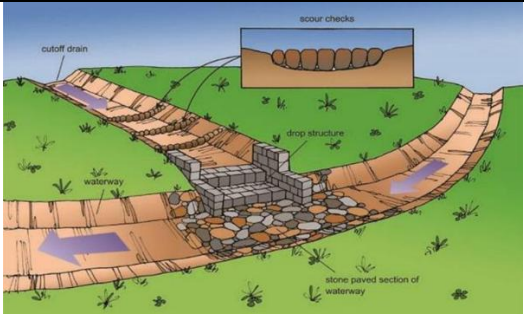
Stabilized drainage system incorporating a cut-off drain, scour checks, drop structures, and stone-paved sections for safe runoff conveyance
